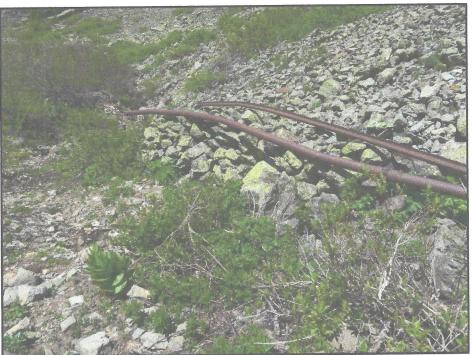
Looking west at the central retaining wall remnant with ore car rail and compressed air pipe disposed on it.
